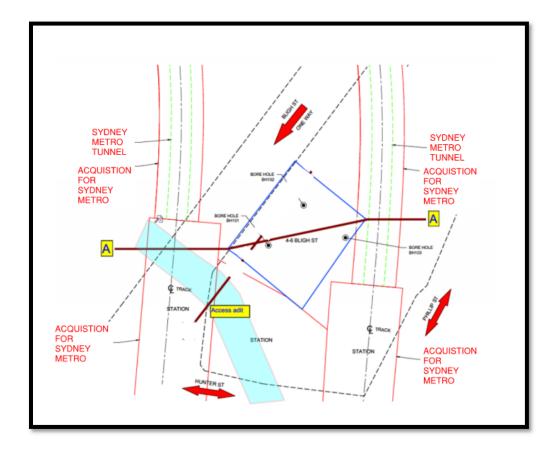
Potential underground structure connecting Martin Place and Bligh St
